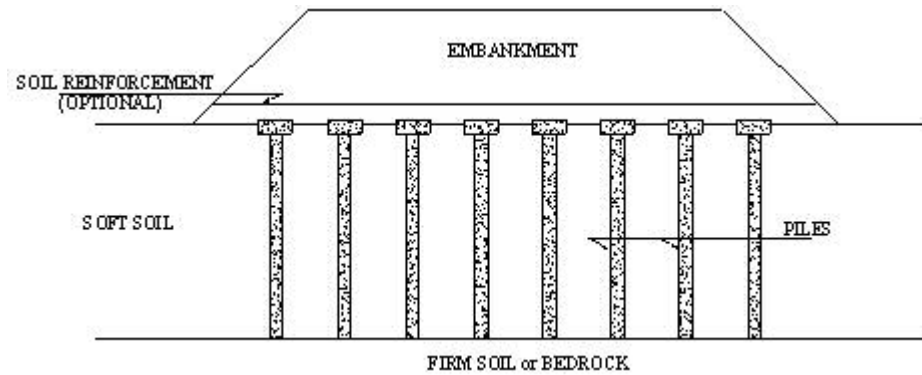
Pile Supported Embankment (Barchard, 1999)
